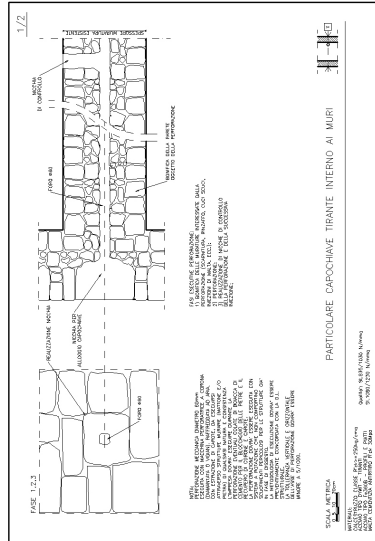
Detail illustrating first step in tying two stone masonry walls together: coring the penetration in the masonry walls and cleaning them out in preparation for the steel rod and epoxy.
